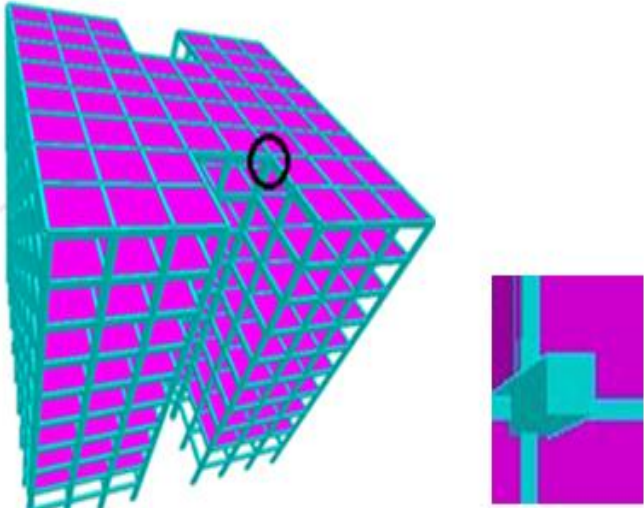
Building Model with Square Shaped Columns (Section A-A)
